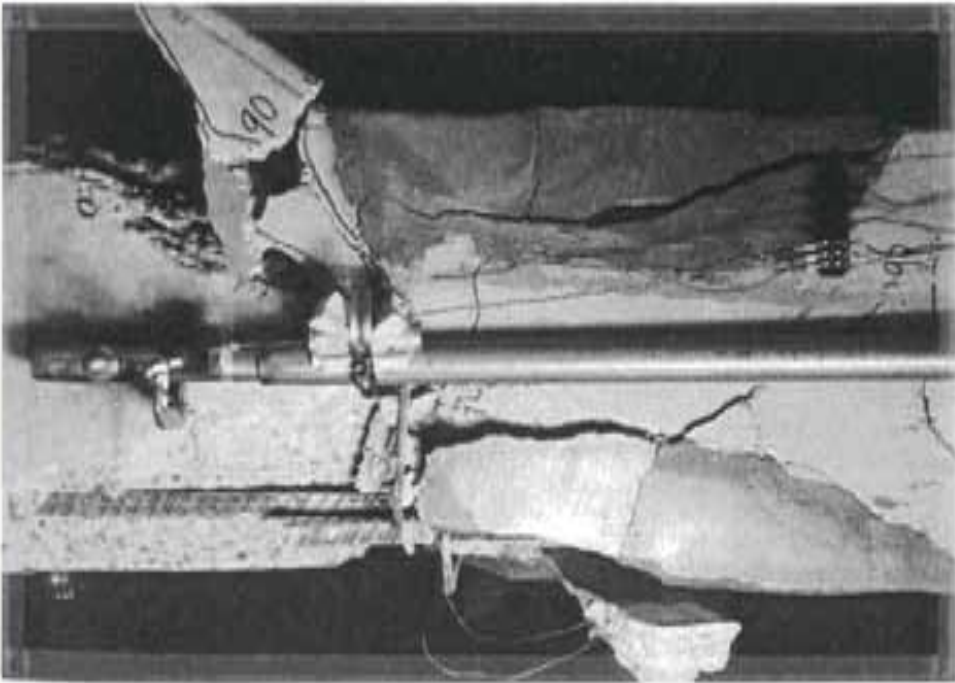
Spalling of concrete cover in specimen S-WS-1
